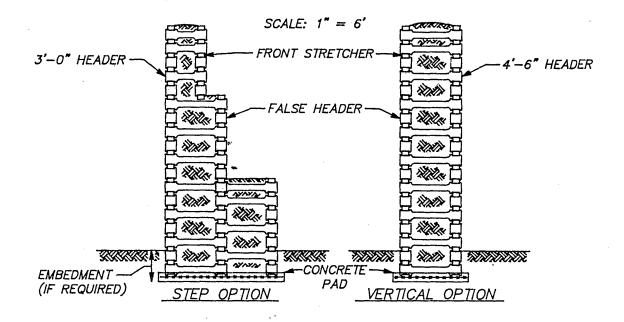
Suggested Criblock Designs for a Free Standing Wall (Provided by the Retaining Walls Northwest, Inc.)
